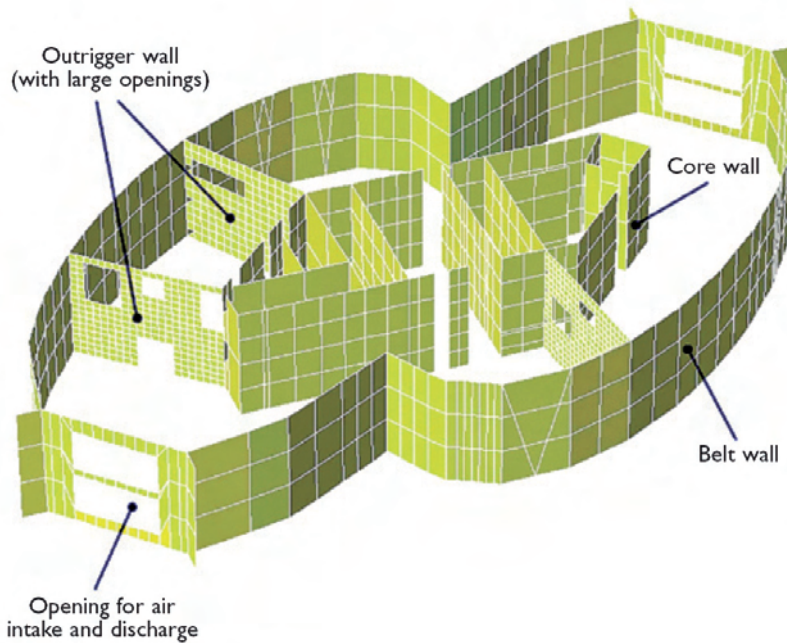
Extract of three-dimensional finite-element model of a plant floor showing core walls, outriggers with openings and external belt walls
